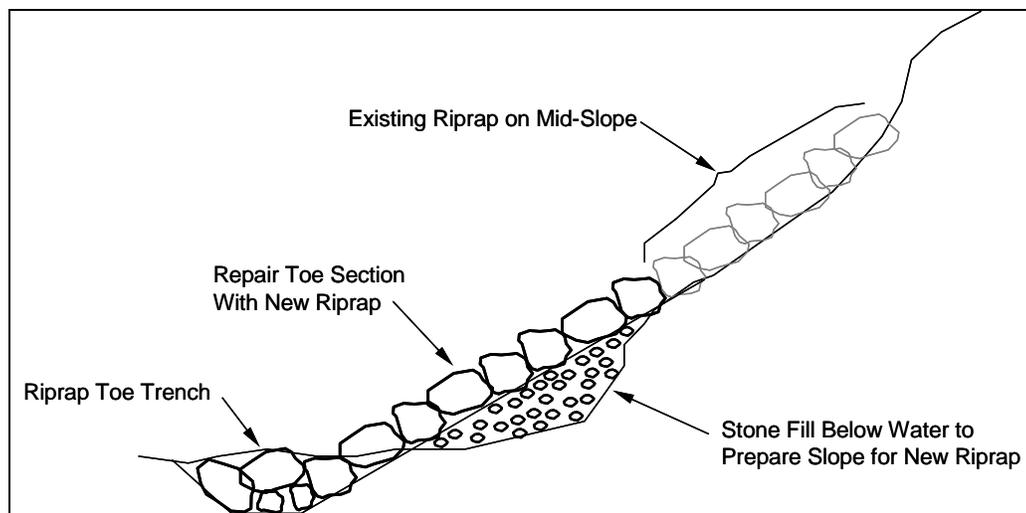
Typical cross section of riprap toe and revetment repair.
